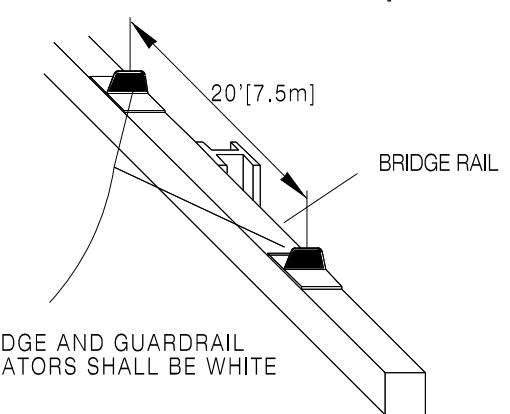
DETAIL FOR BRIDGE END PROTECTION FOR REVERSE TRAFFIC DIRECTION
